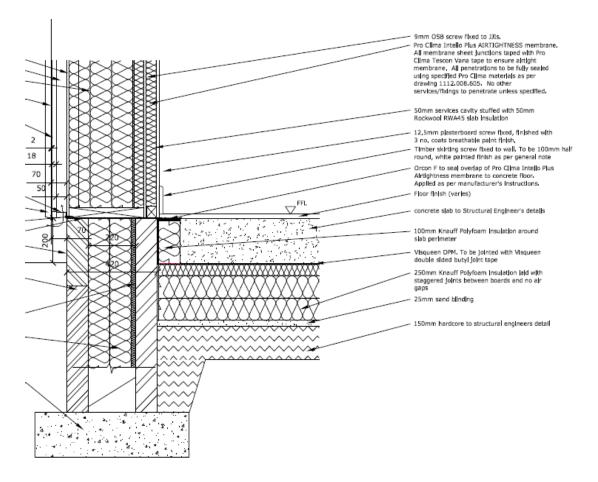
Case study ground floor and foundation sectional schematic detailing (Kirsty MaGuire Architects, 2012)
